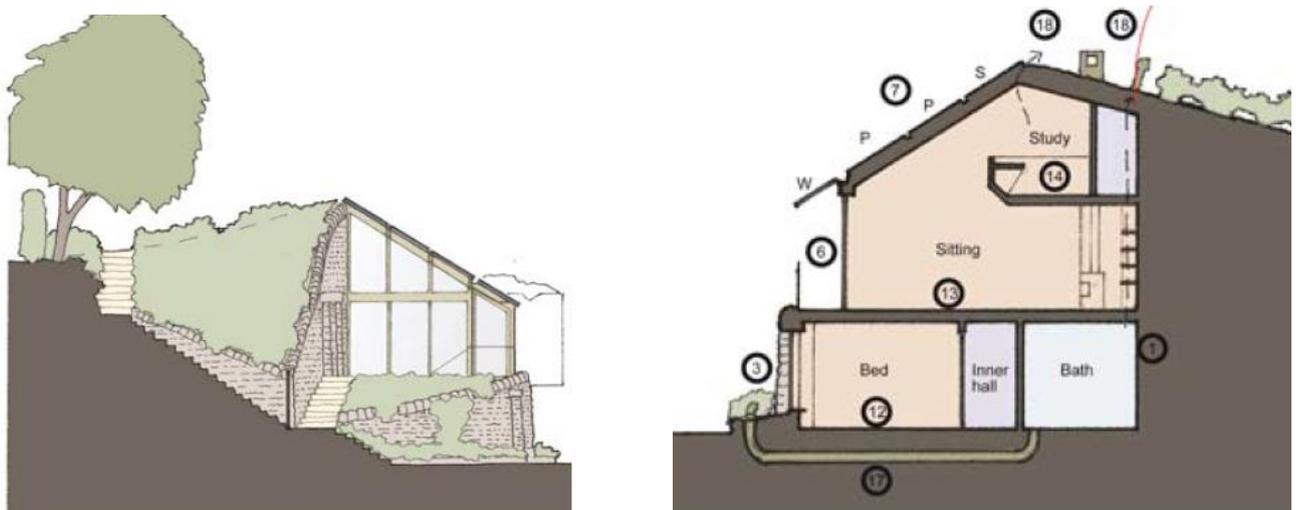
(a) West Elevation; (b) Section with south facing roof and the earth tube
